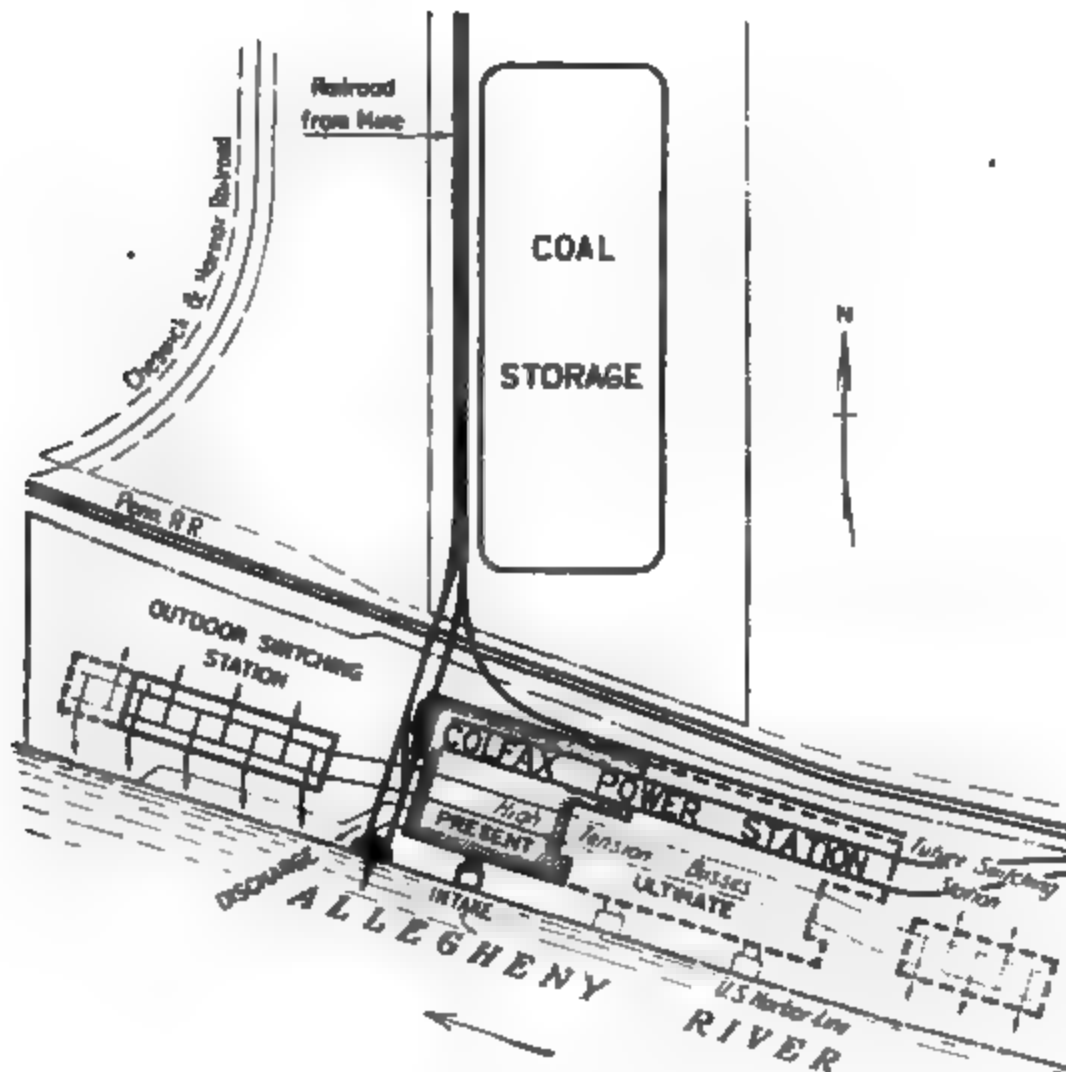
Plan of Colfax station showing location of coal storage, powerhouse and switching station.
